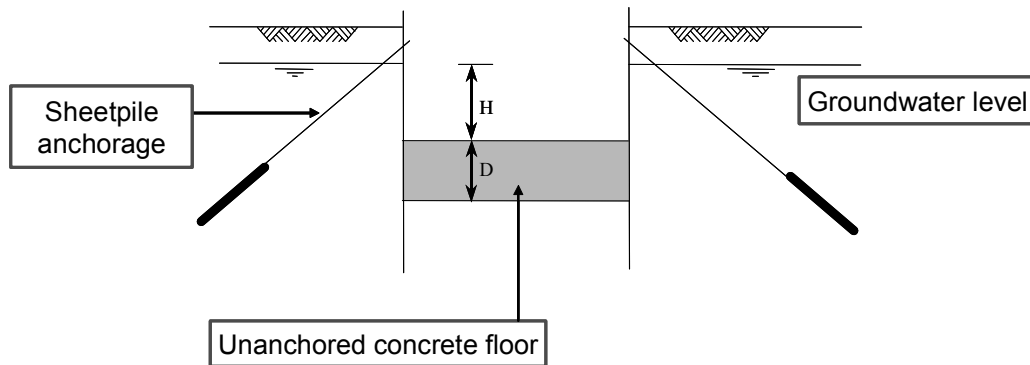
Cofferdam with unanchored concrete slab (gravity slab)
